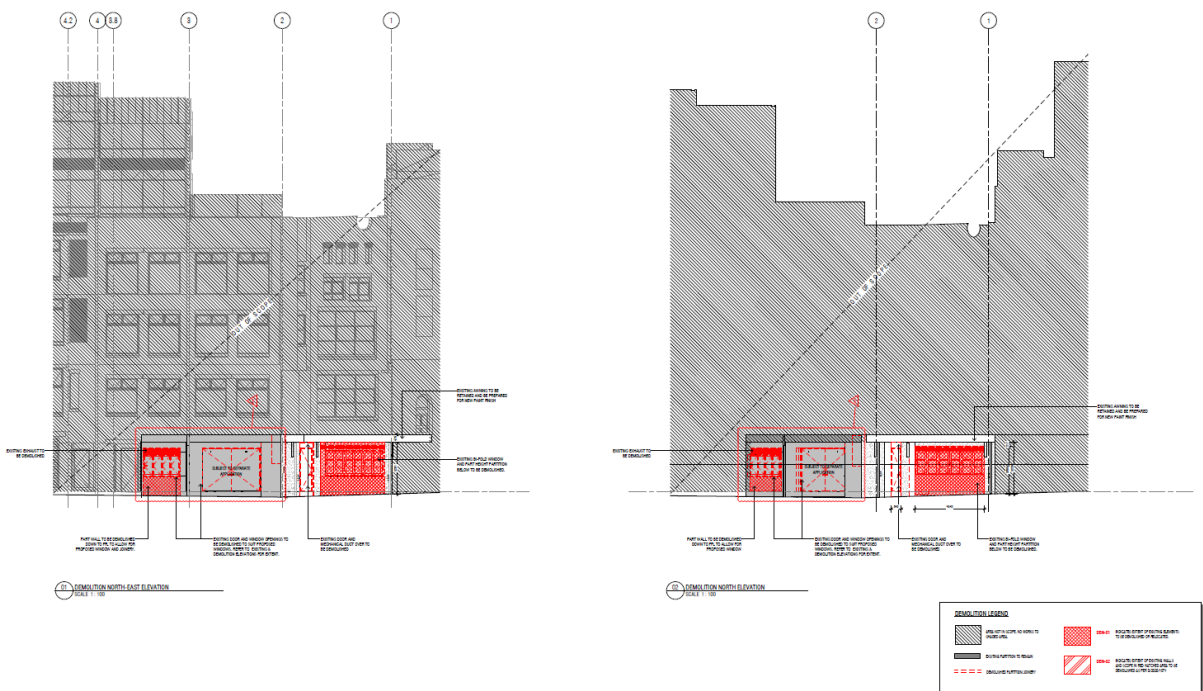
Proposed north-east Foley Street (left) and north Burton Street (right) demolition elevations
